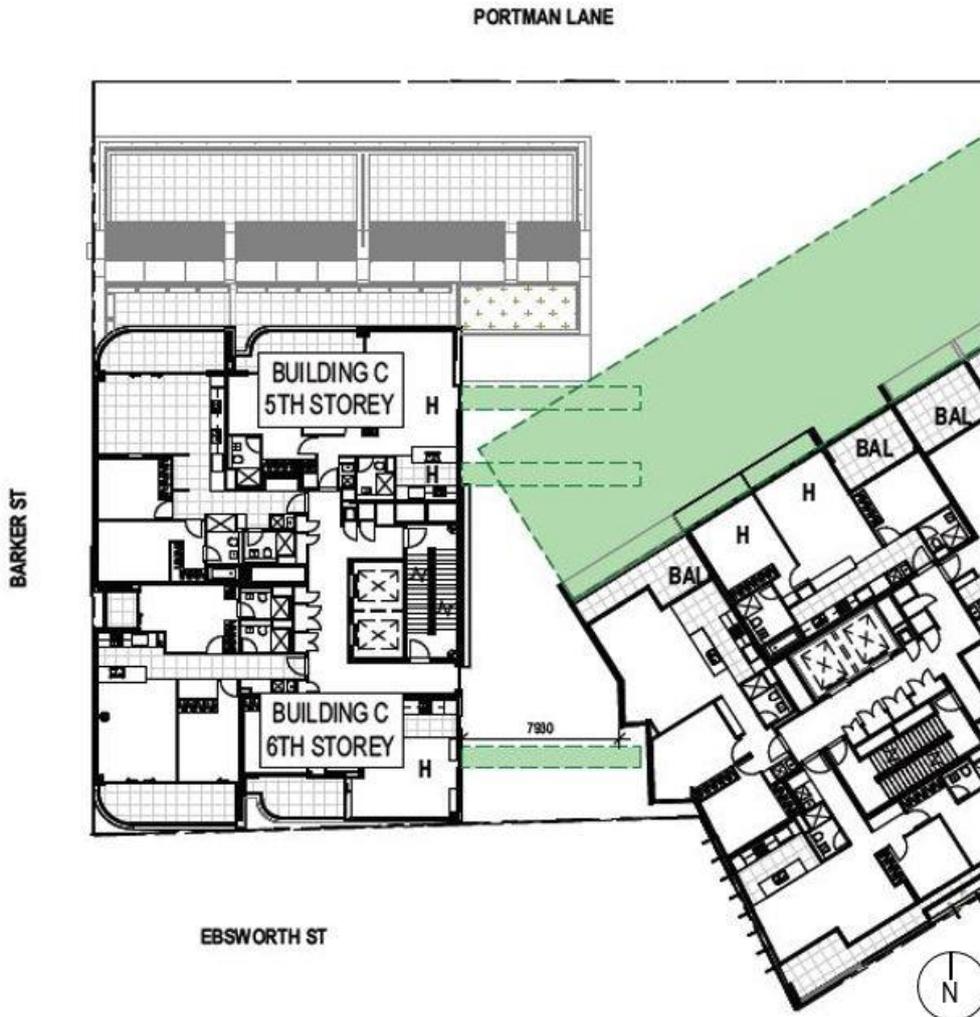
Separation drawing for Levels 5 to 8 Buildings B & C.
